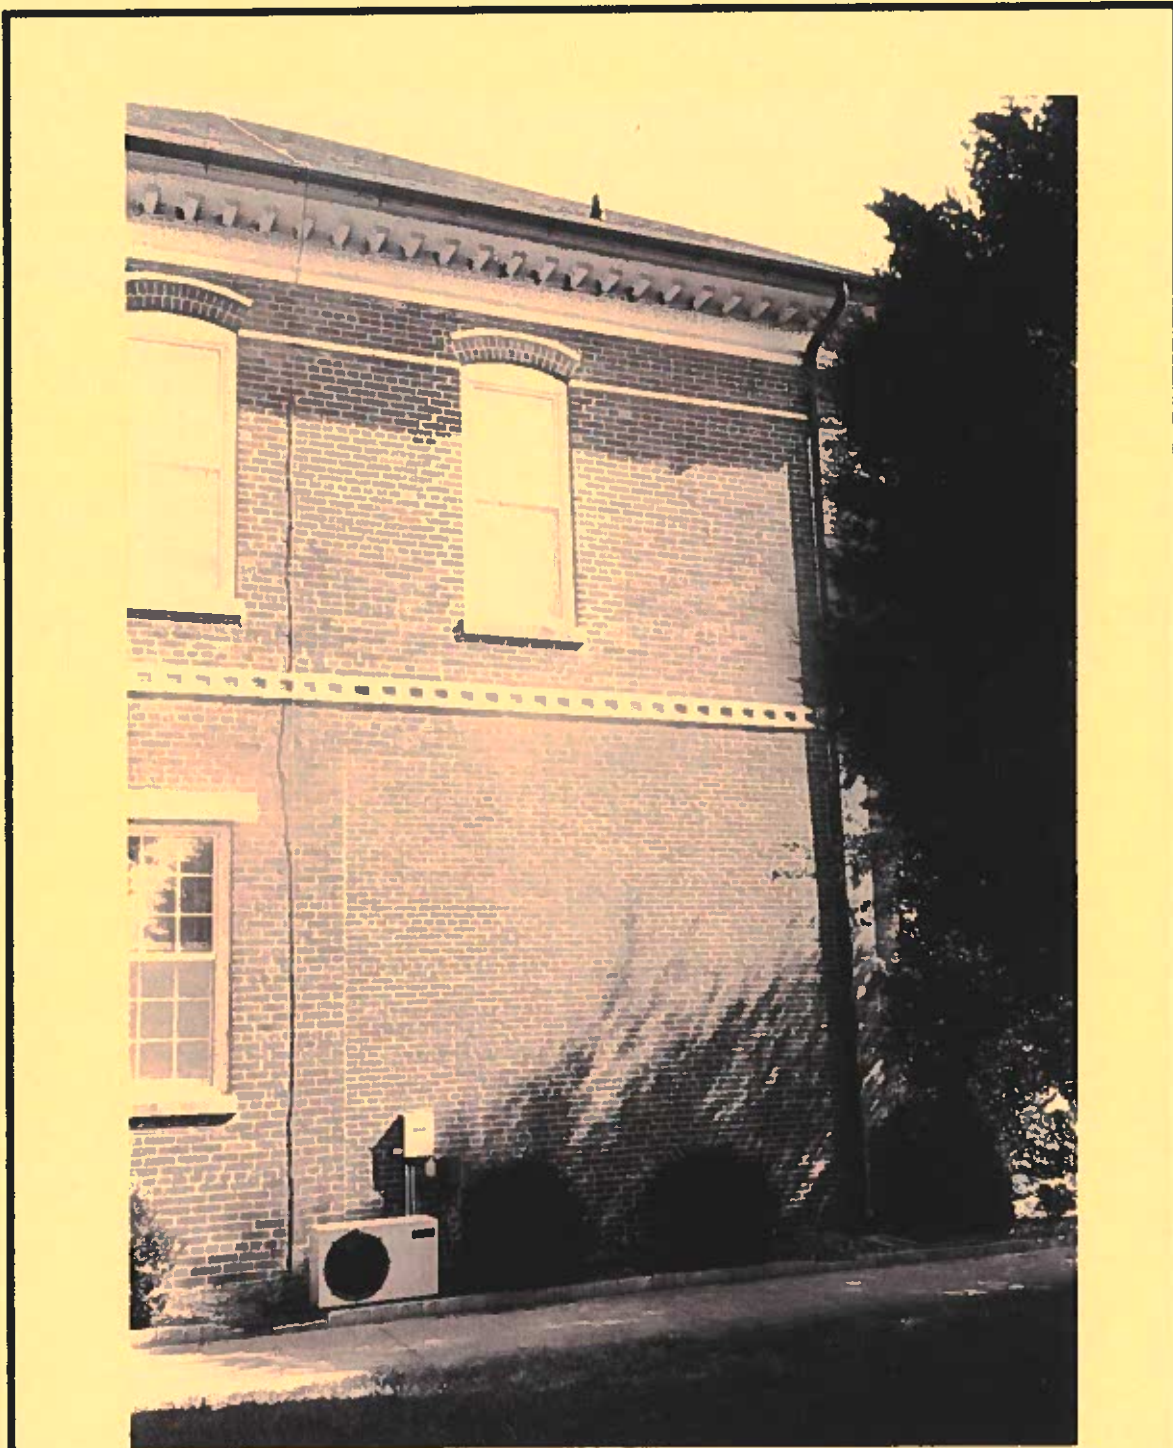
Currituck County Courthouse, west elevation, detail showing vertical joint between c. 1842-1844 brickwork and 1897-1898 brickwork.
